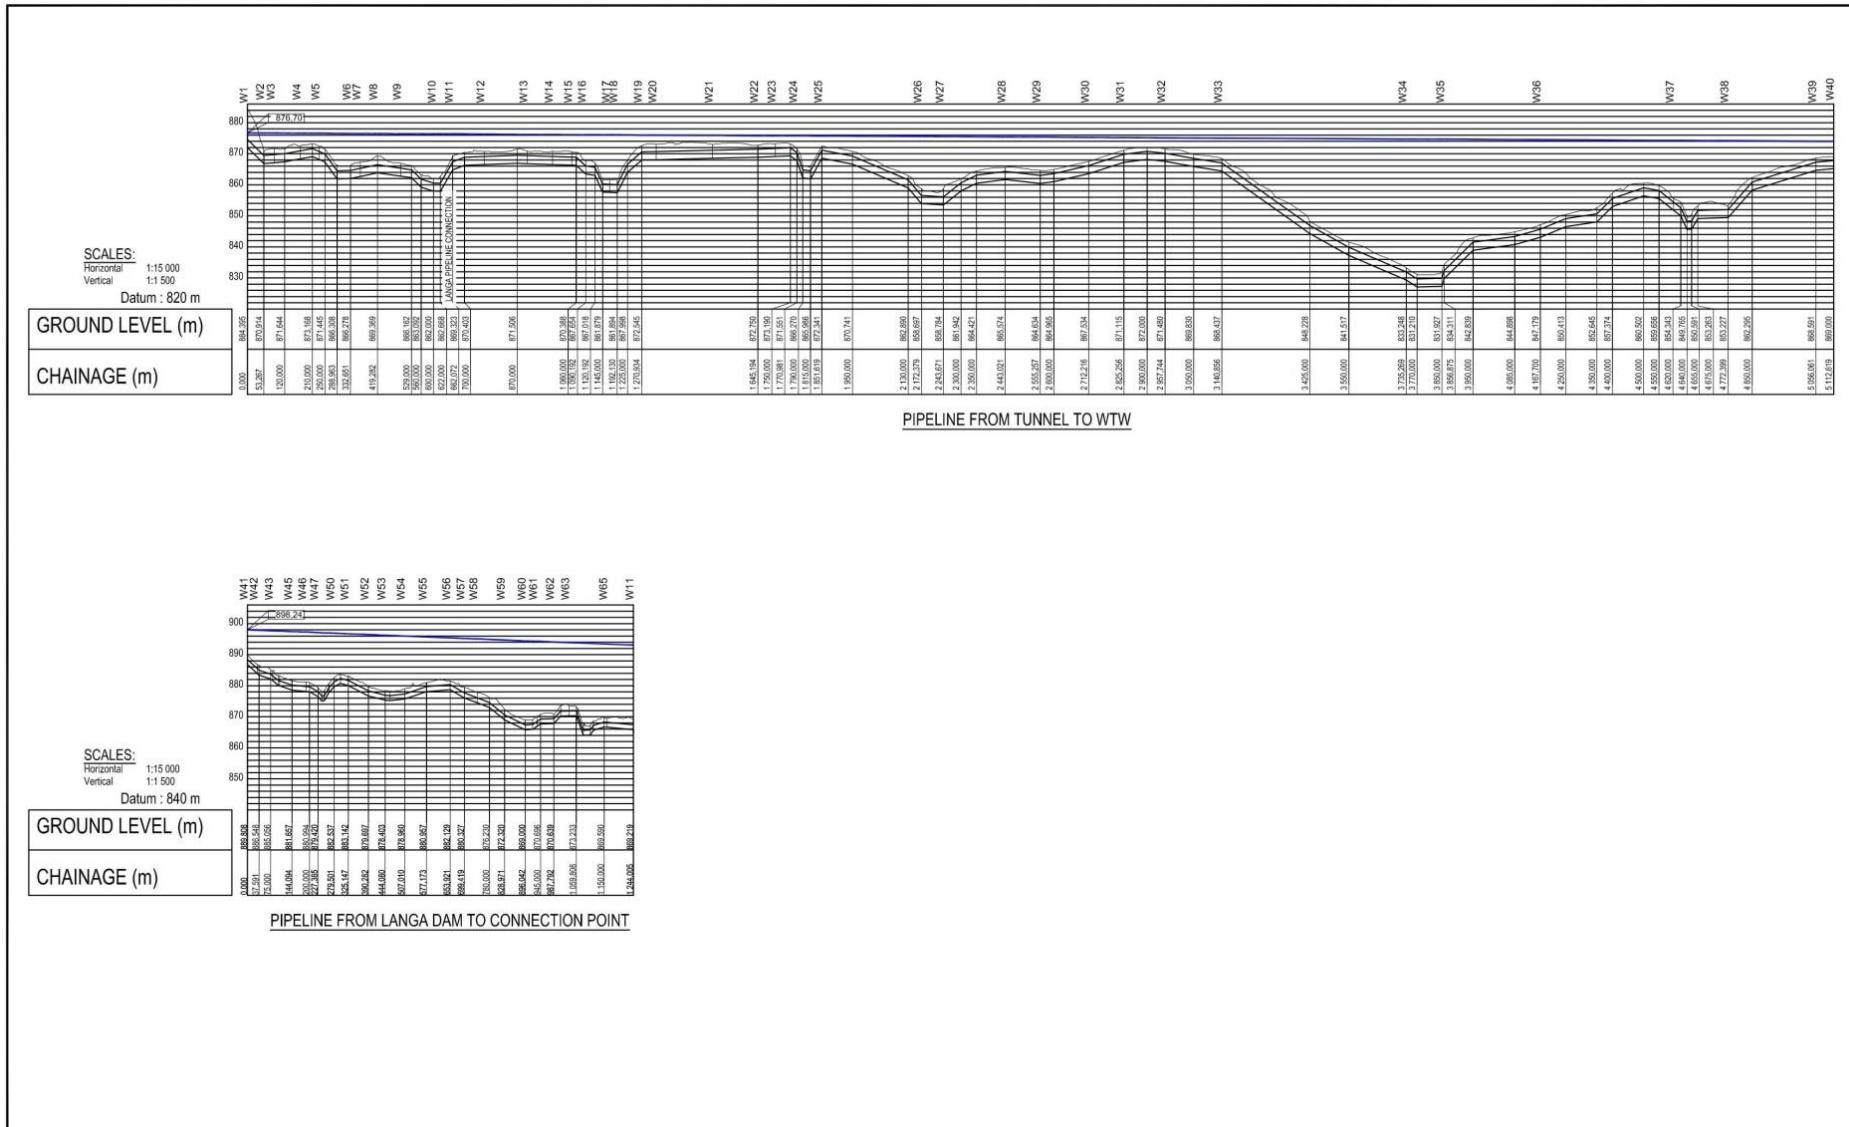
A.2: Longitudinal sections of the raw water pipeline
